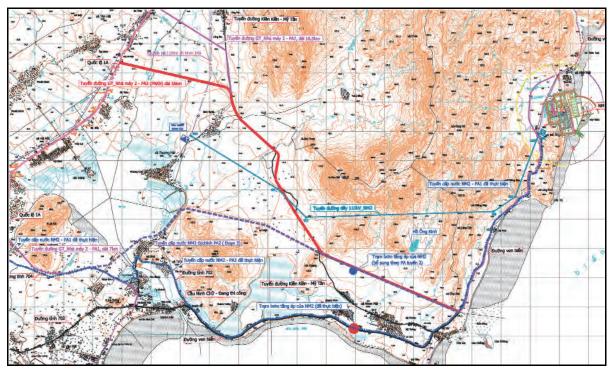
Access Road Plan to Nuclear Power Plant No. 2
